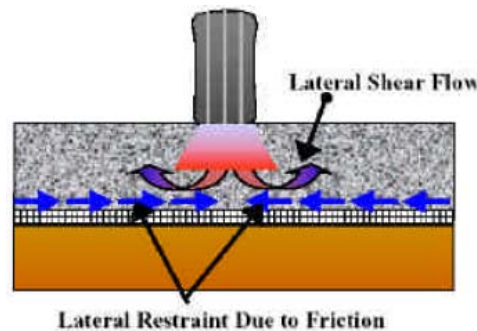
Diagrammatic view of Geotextiles serving as reinforcement in the pavement.
